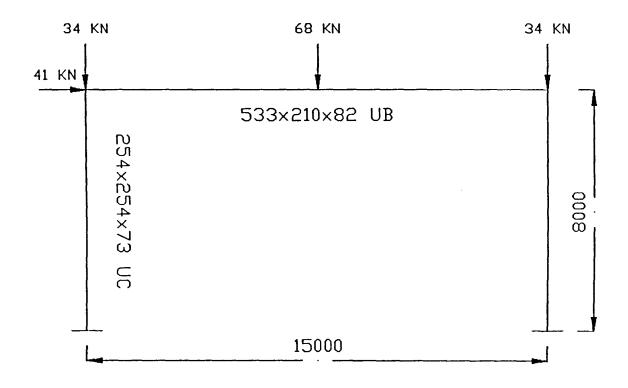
GEOMETRY, SECTIONS AND LOADING OF SINGLE STOREY SINGLE BAY FRAME
